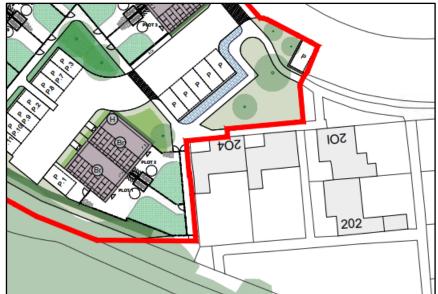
Proposed Site Layout Plan and relationship to adjoining residential properties
